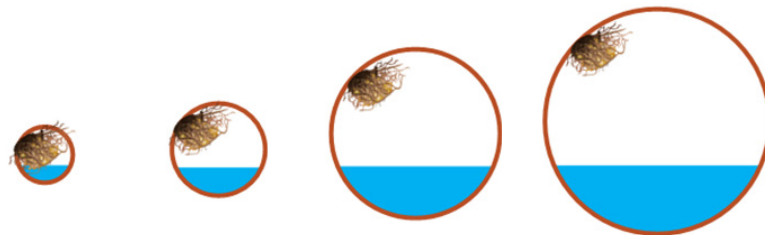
Impact of Pipe Sags on Air Gap Between Manholes
